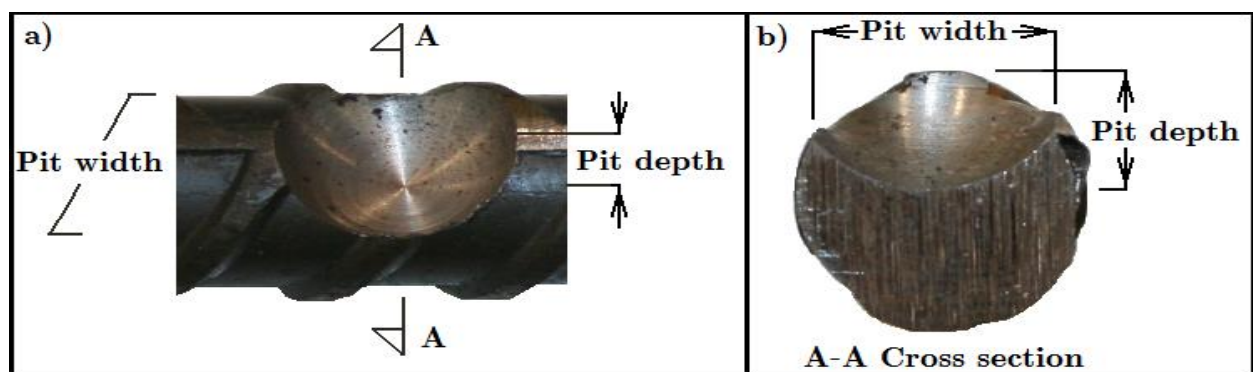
(a) A typical 3D of pit configuration and (b) its cross section with pit depth and width
